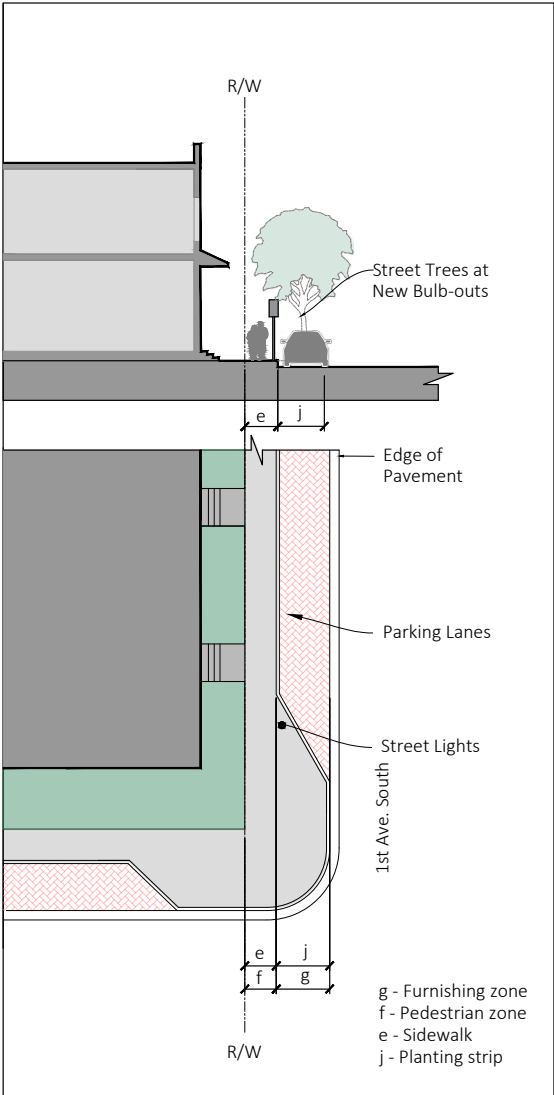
1ST AVE. SOUTH STREETSCAPE
